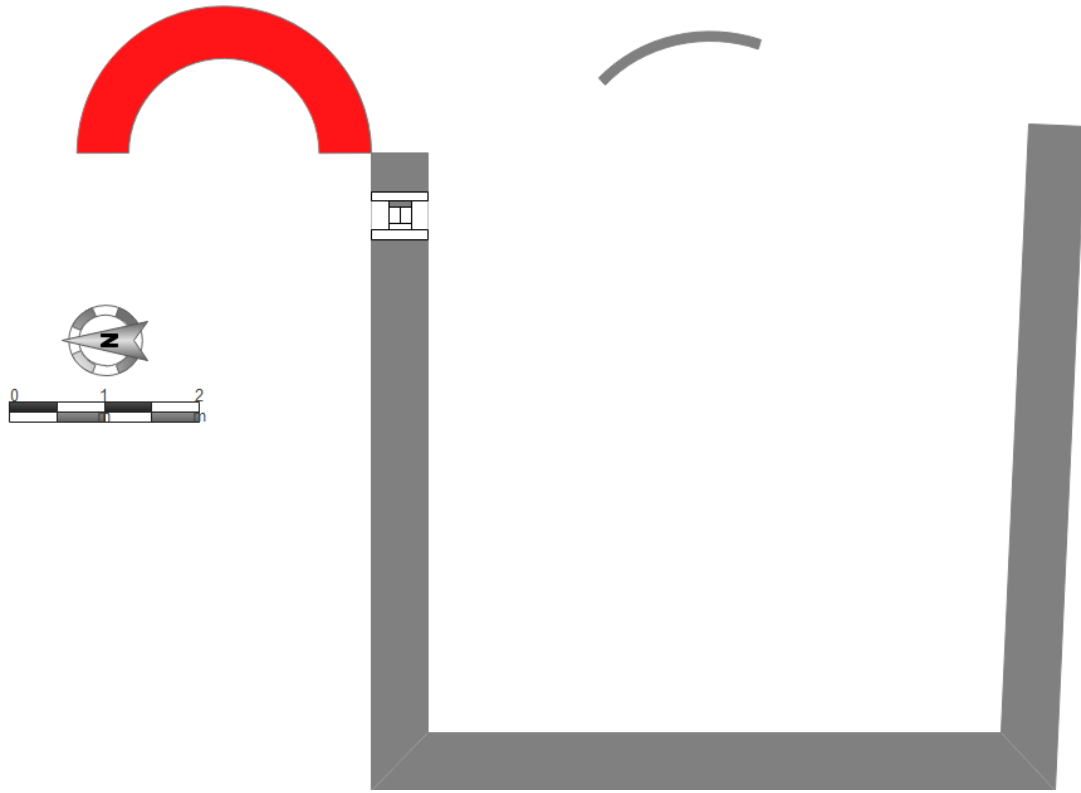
Plan of Church B at Tigani. (M. Pawlowski)
